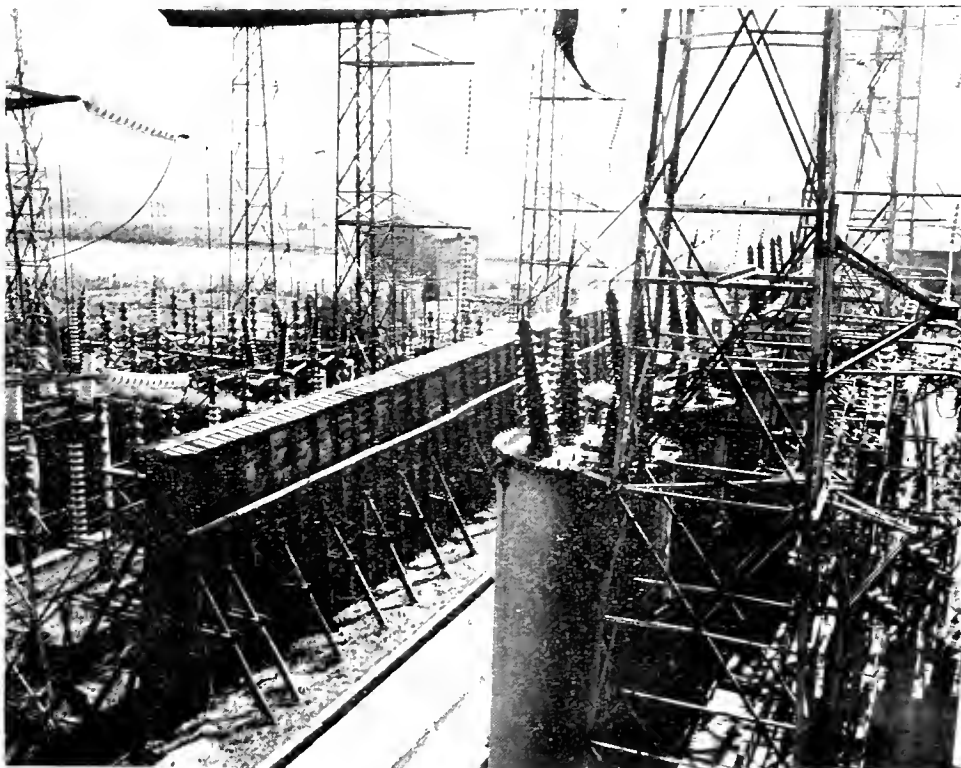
Komatsugawa substation —140-KV transformers. Note cinder-filled wooden protection barriers
